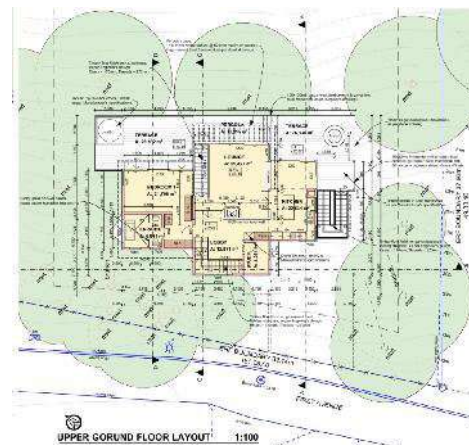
Upper ground floor layout (DEM TECH, 2020)
